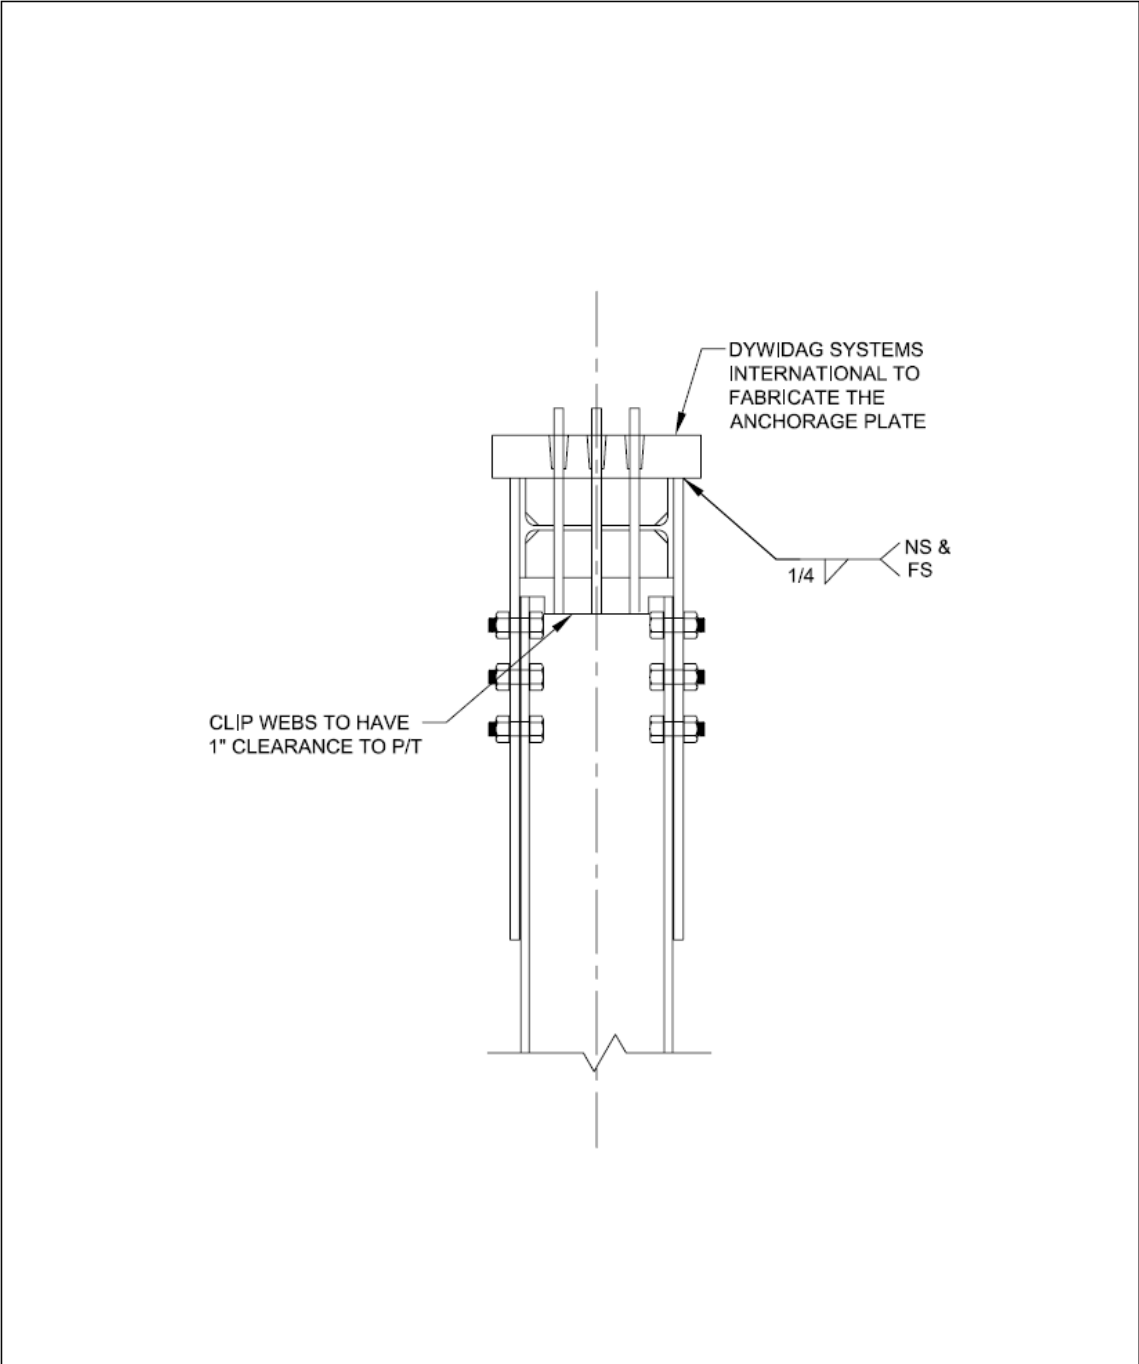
Specimen Design Drawing – Top Post-Tensioning Anchorage
